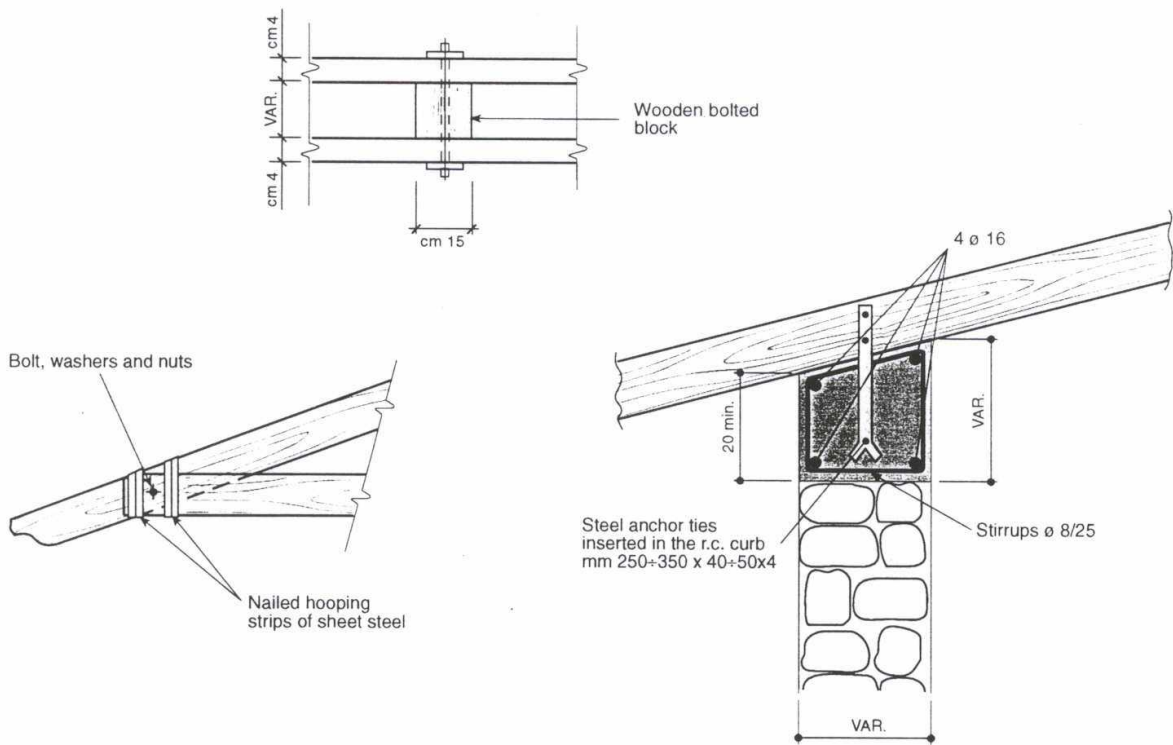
B: Seismic Strengthening - Installation of a New RC Ring Beam at the Roof Level
